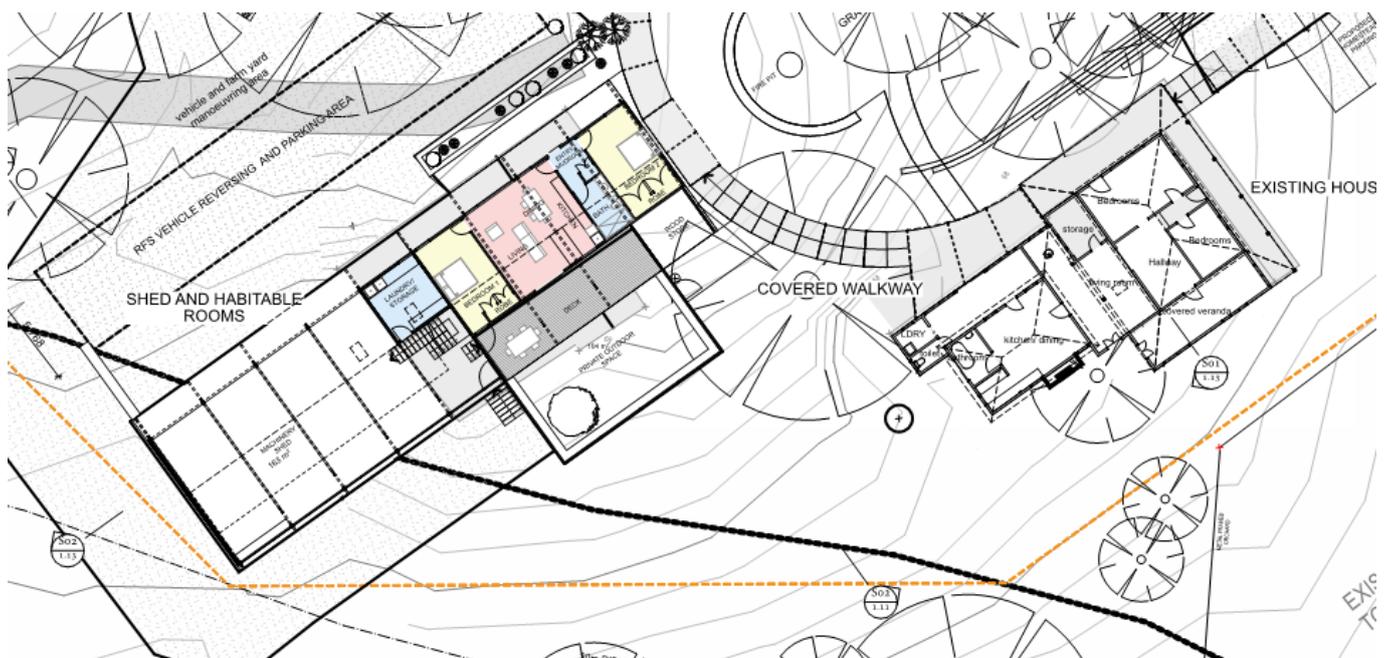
Extract from Proposed Site Plan identifying Detached Habitable Rooms
